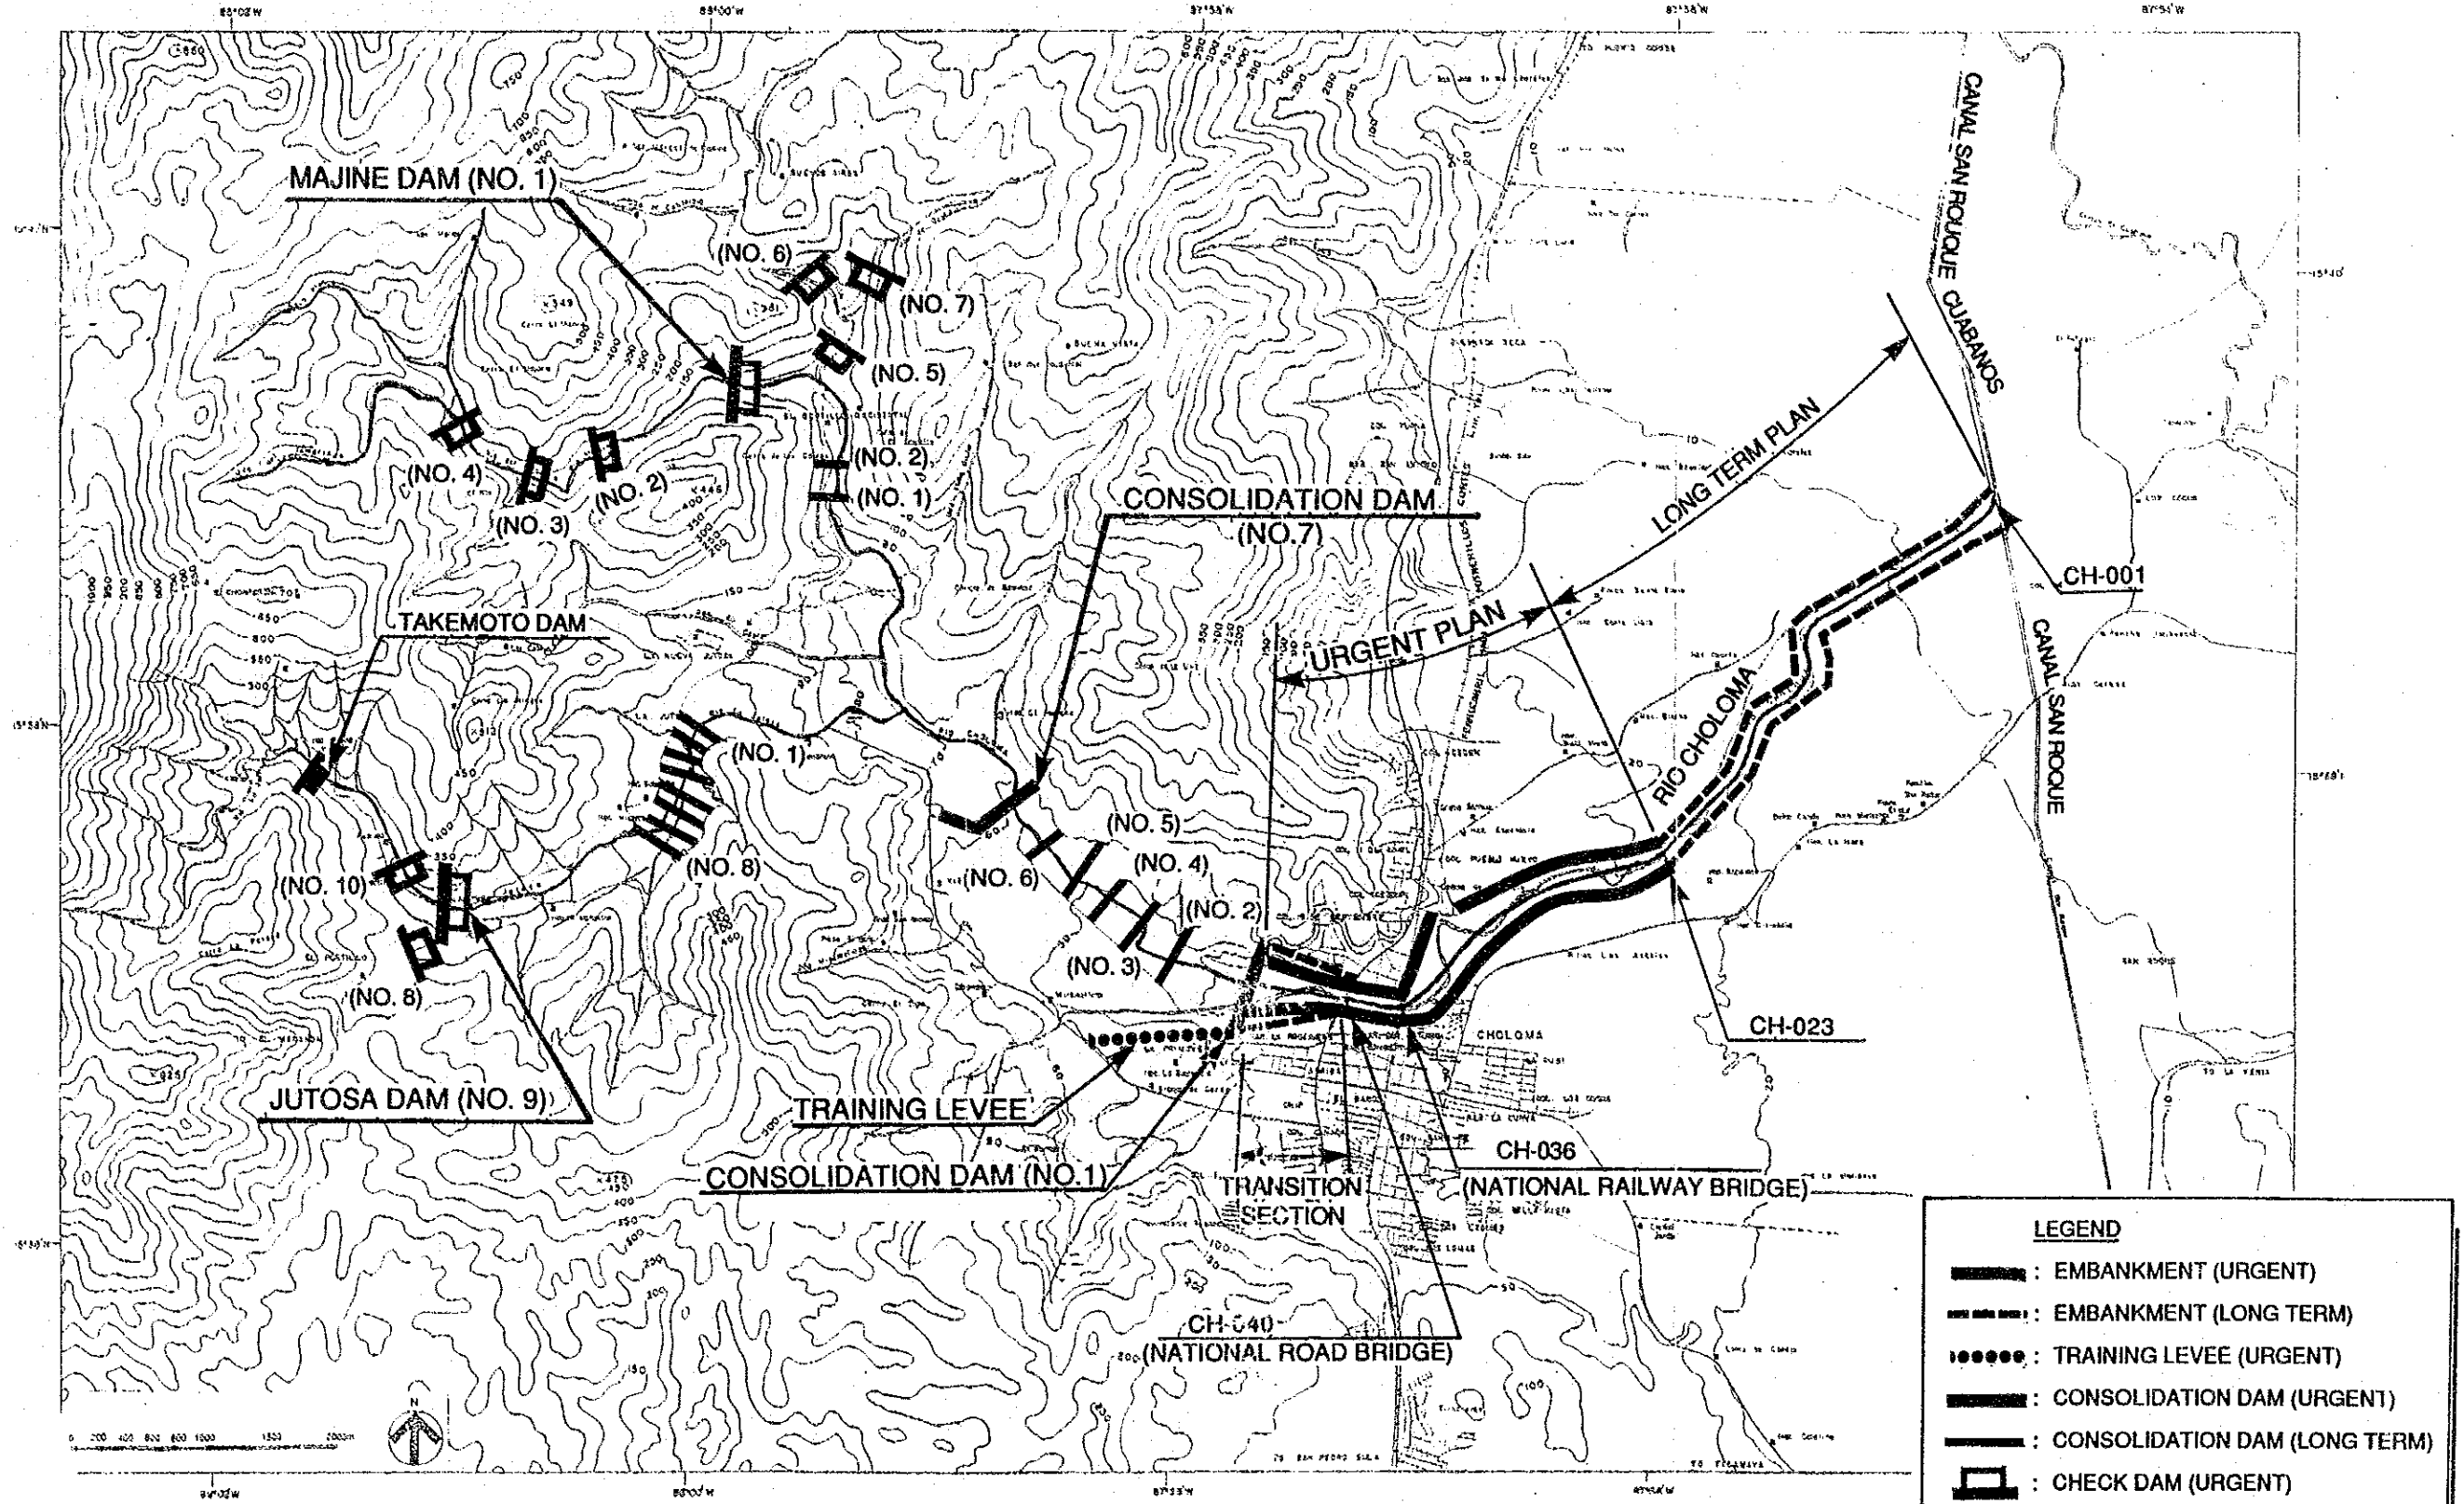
PROPOSED FACILITIES FOR THE LONG TERM PLAN AND URGENT PLAN OF THE RIO CHOLOMA
